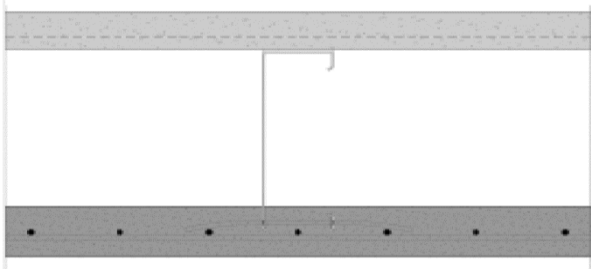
Diagram of steelframe floor element, consisting of a reinforced concrete bottom layer and an anhydrite top layer connected by steel C-profiles.
